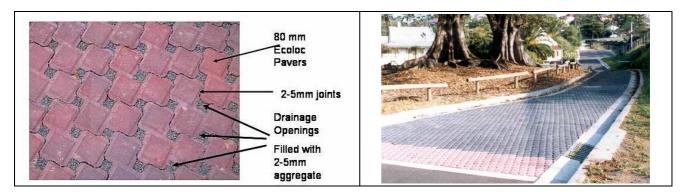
Permeable concrete eco-paving using concrete segmental pavers.
